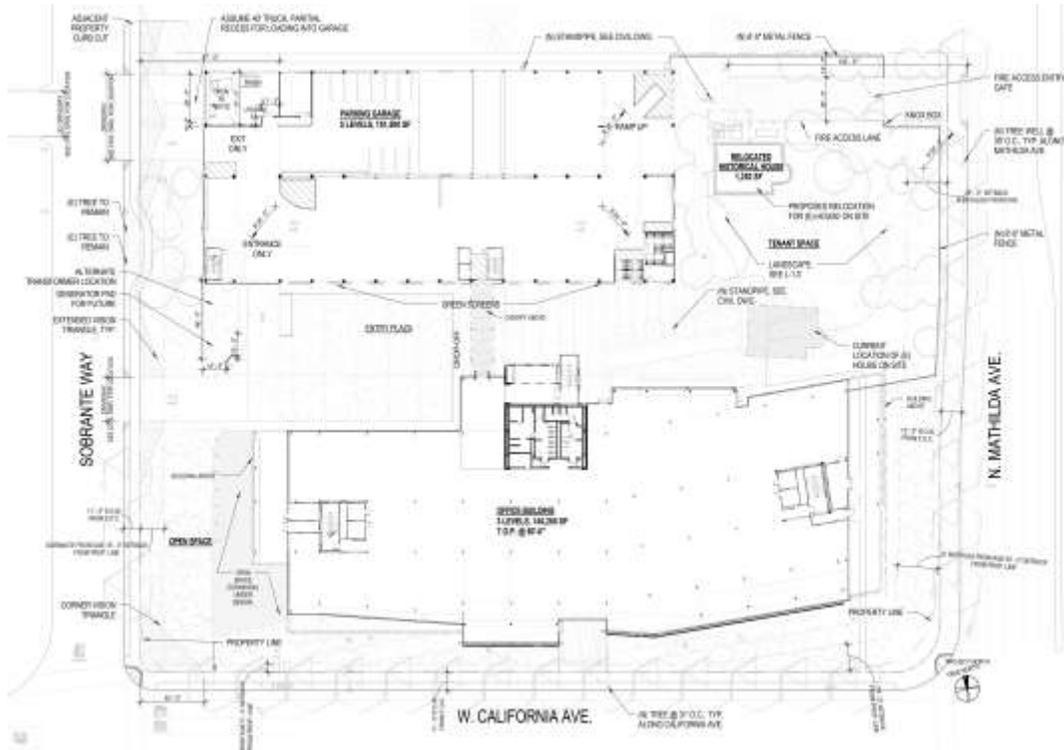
Site Plan showing full site development. The historic house is at the upper right.
